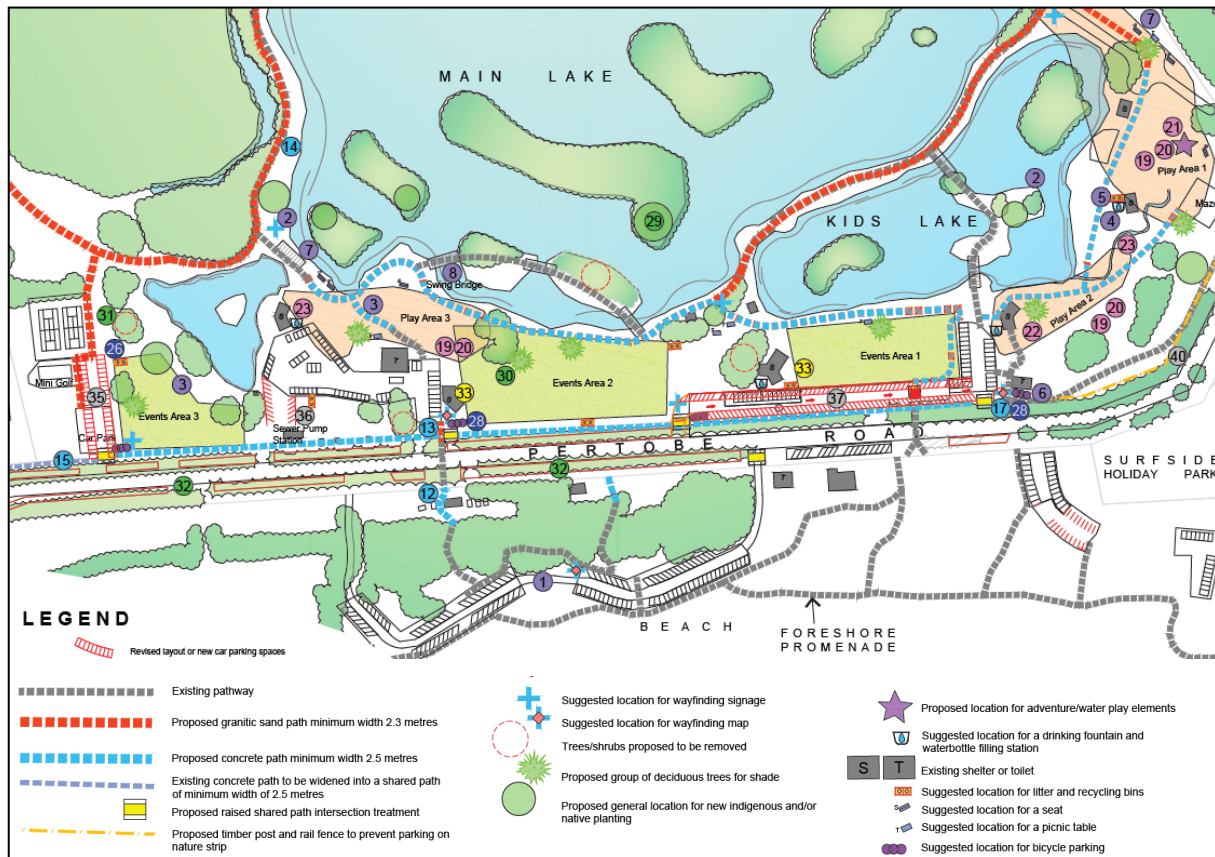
Lake Pertobe Road Precinct – Masterplan Recommendations (2018)
